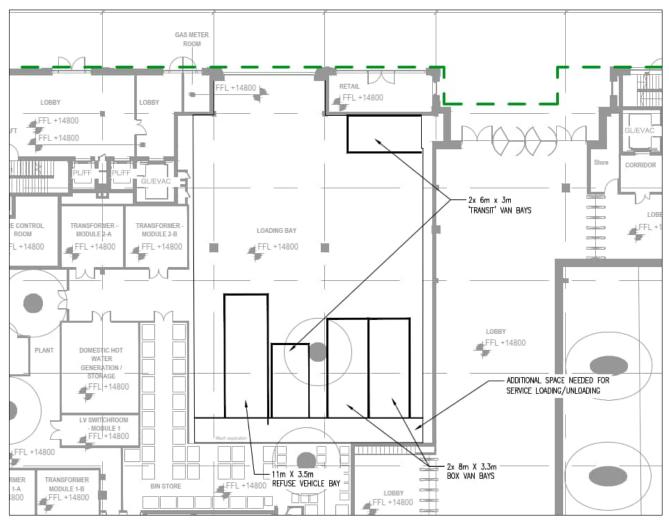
Proposed Plot 1 Service Yard Layout
